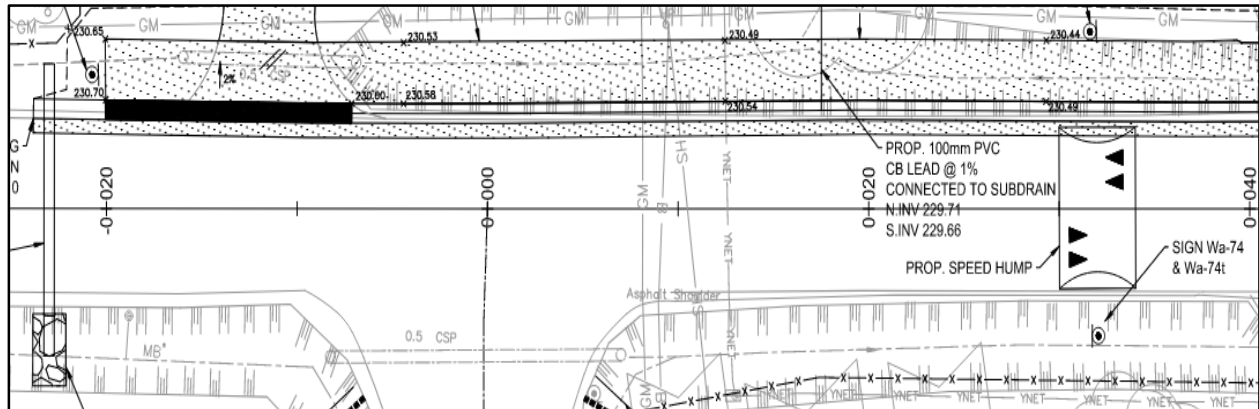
2025 MUP Design, Plan View at Forestry Drive
